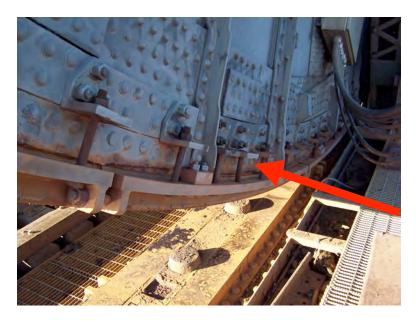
Missing connection bolt between curved track plate and segmental girder
